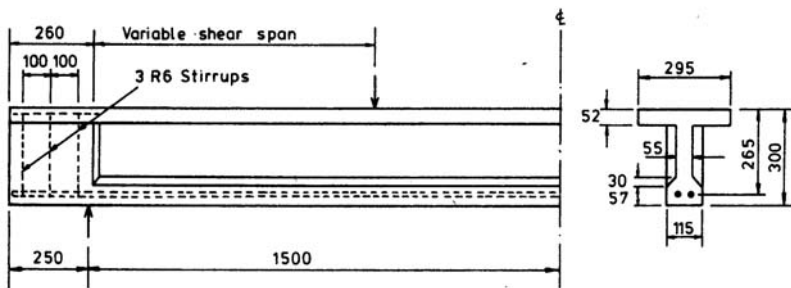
Elevation and section of test beam (Adapted from Swamy et al., 1993: Conversion: 1 mm = 0.039 in.)
